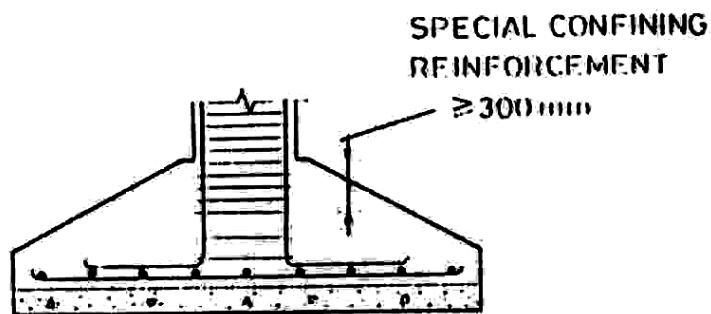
PROVISION OF SPECIAL CONFINING REINFORCEMENT IN FOOTINGS
